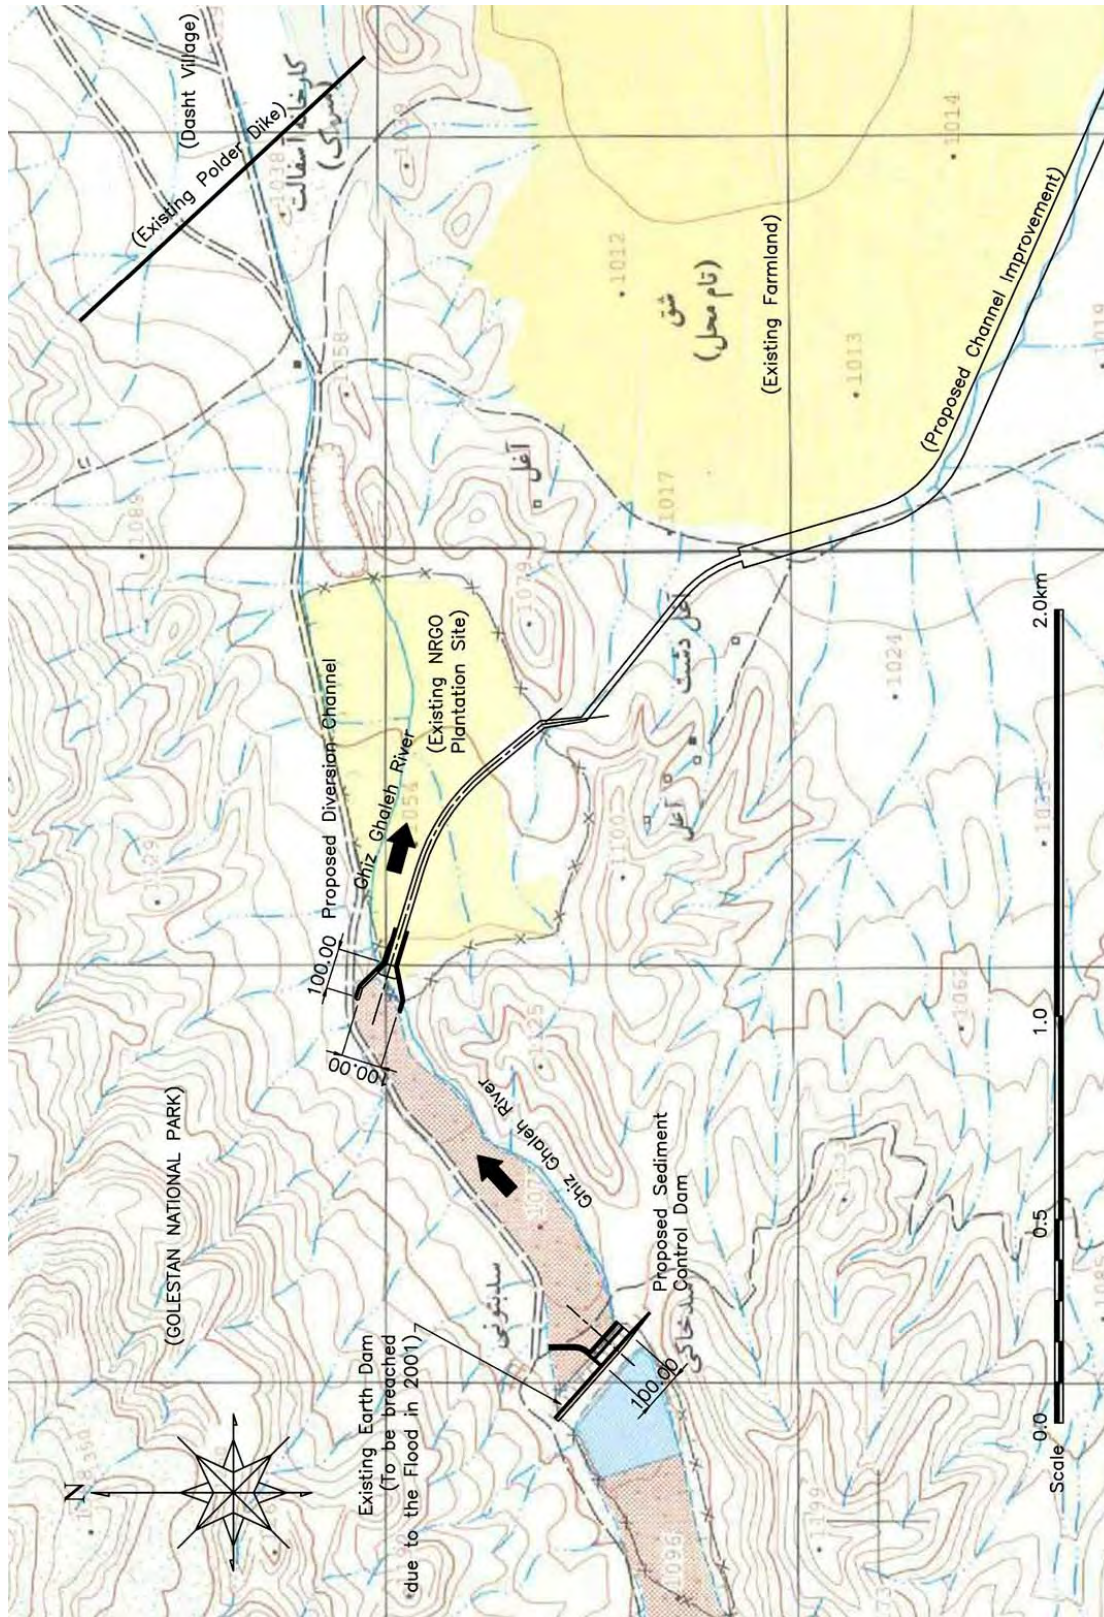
Proposed Arrangement of Sediment Control Dam Facilities
